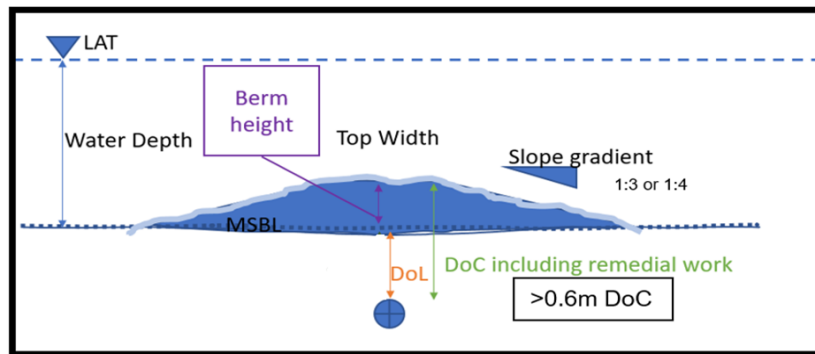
Remedial Rock Berm Design (Not to Scale)
